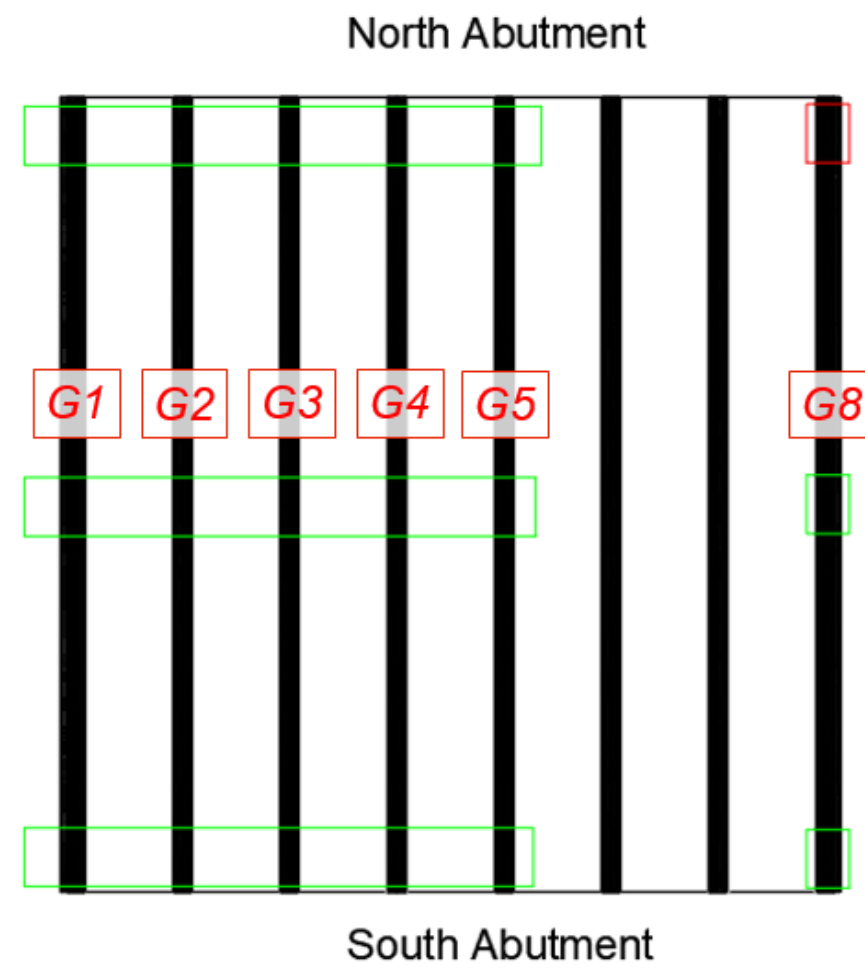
Plan View of Sensor Layout for 1<sup>st</sup> Yutan Bridge Load Test
